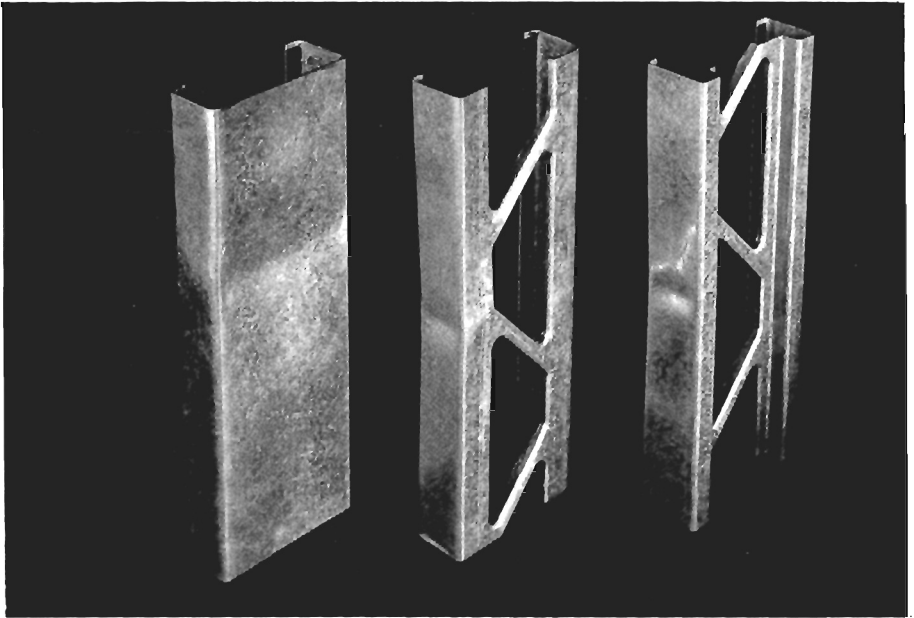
PHOTOGRAPH OF TYPICAL FAILED STUD COLUMN SPECIMENS
